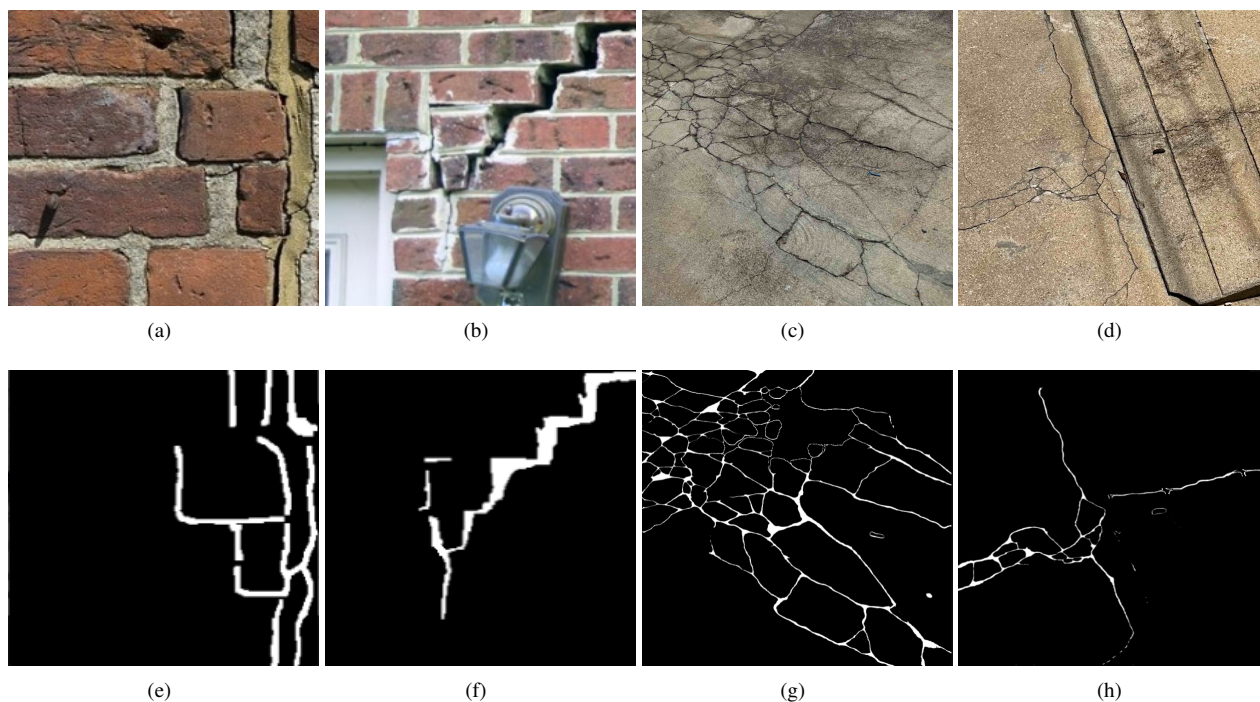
Example of map cracks: (a) horizontal and vertical cracks in the brick, (b) map stair-step cracks in the corner of the door, (c) map of cracks in the floor, (d) floor cracks, (e) segmented image from (a), (f) segmented image from (b), (g) segmented image from (c), and (h) segmented image from (d).
